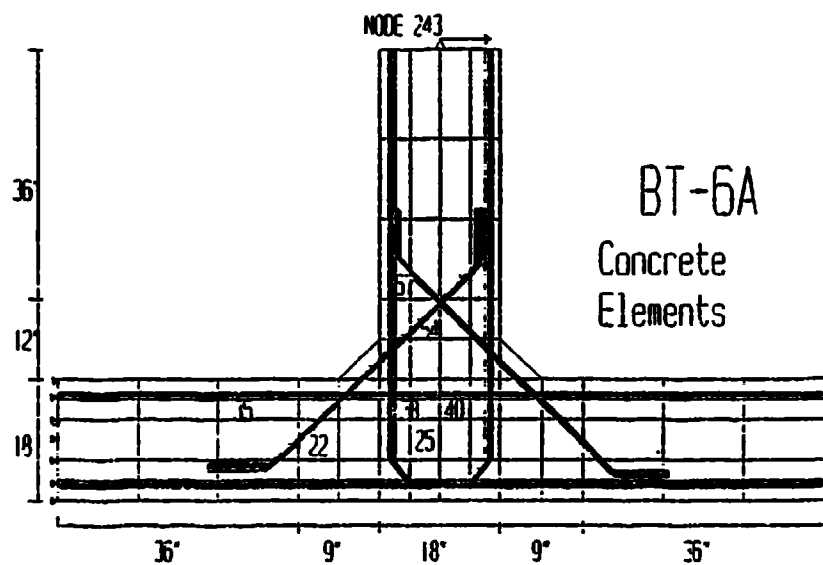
Connection detail BT-6A with labeled concrete and steel reinforcement elements.
